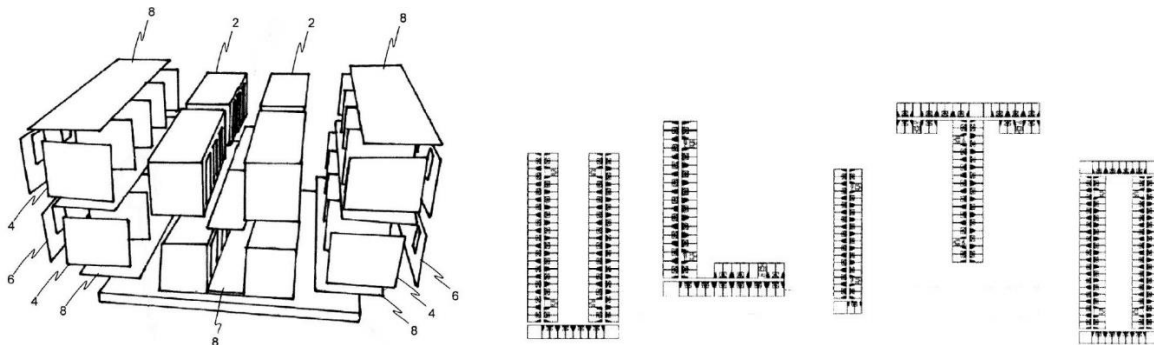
Hotel MOXY principal structural scheme (left) and possible floor layouts (right) [5]. 2) module (webox); 4) and 6) façade panel; 8) slab panel (room and corridor)
